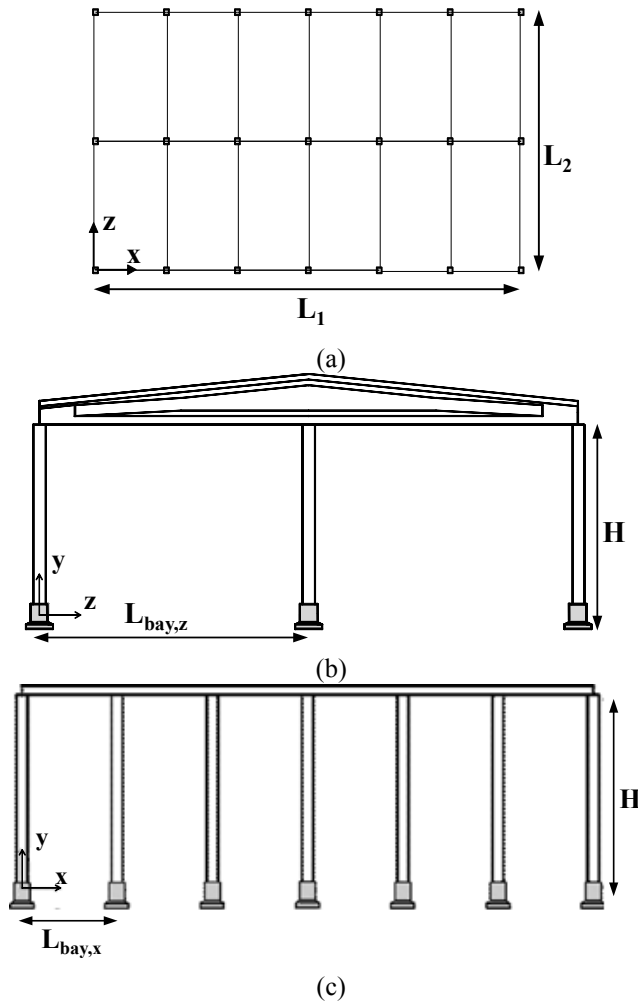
Benchmark one-story precast building: a plan view, b transversal bays and c longitudinal bays
